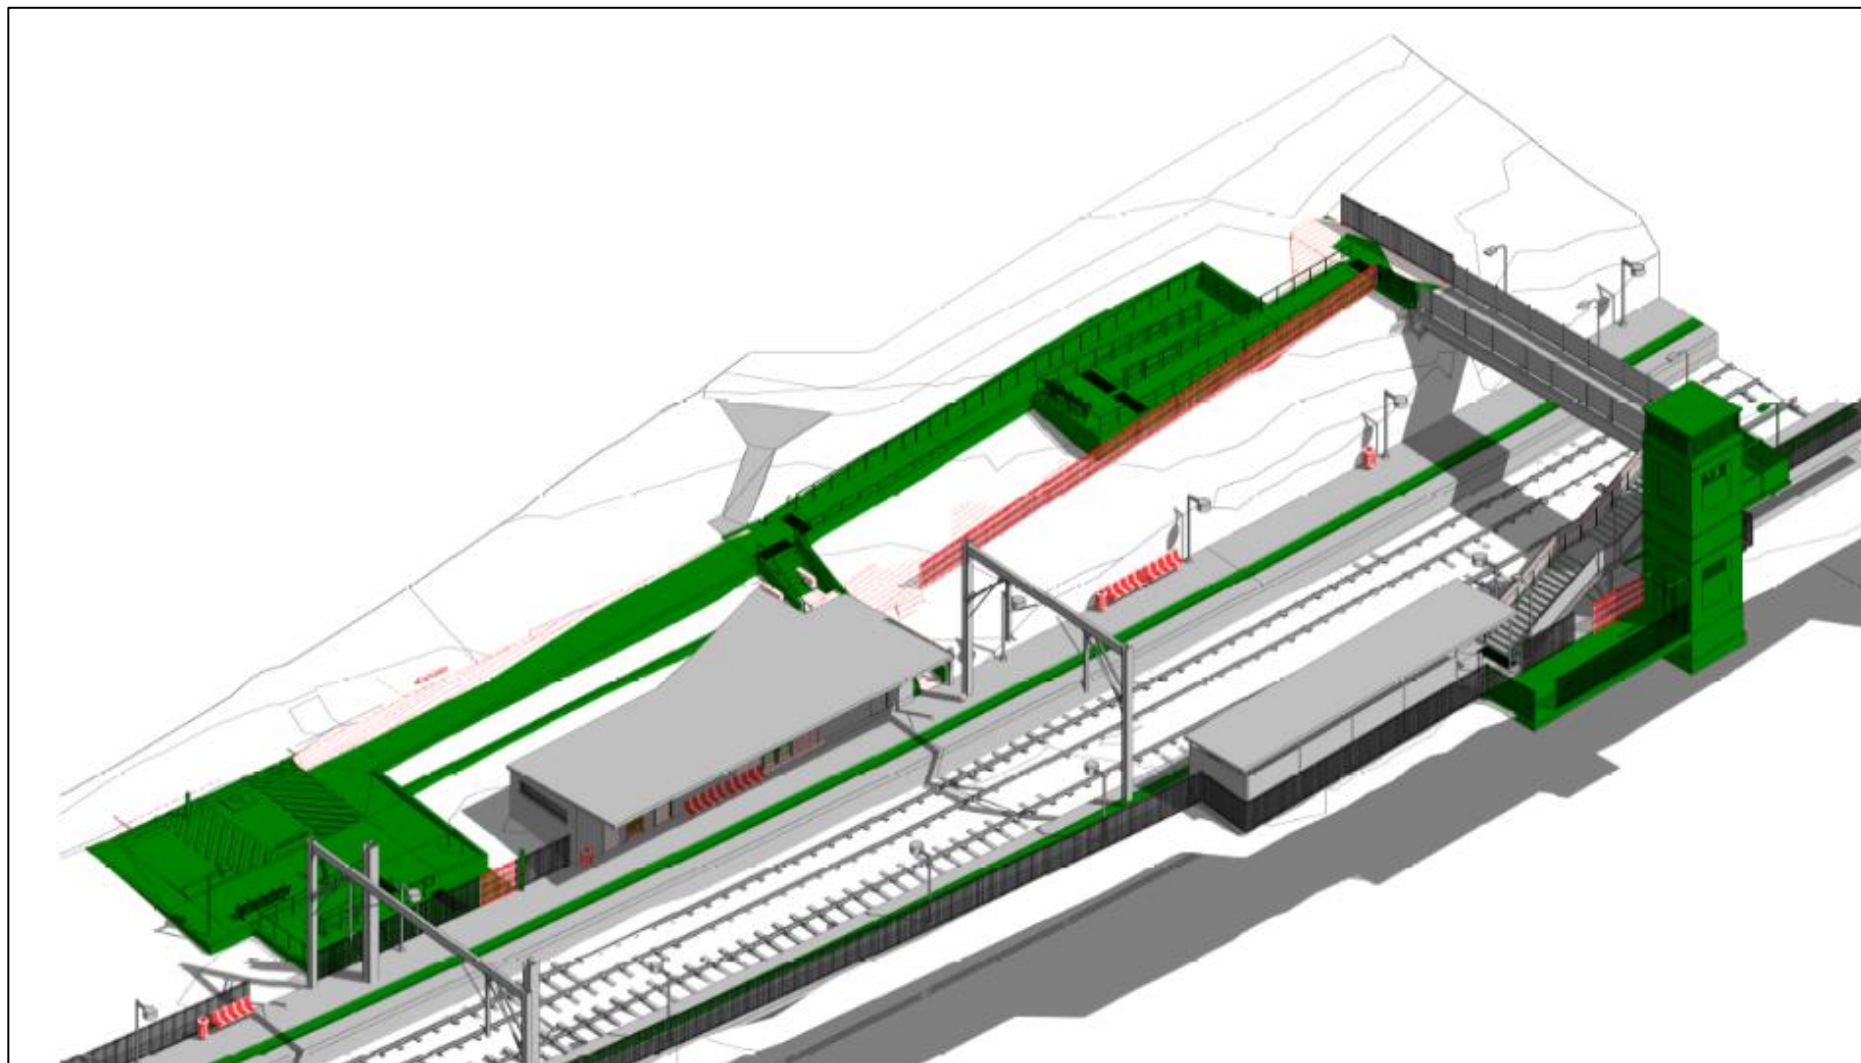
Axonometric of Option 2 (subject to detailed design). In this image, grey indicates existing buildings, green indicates proposed works and red represents demolition works (Stantec, 2018: Appendix A).
